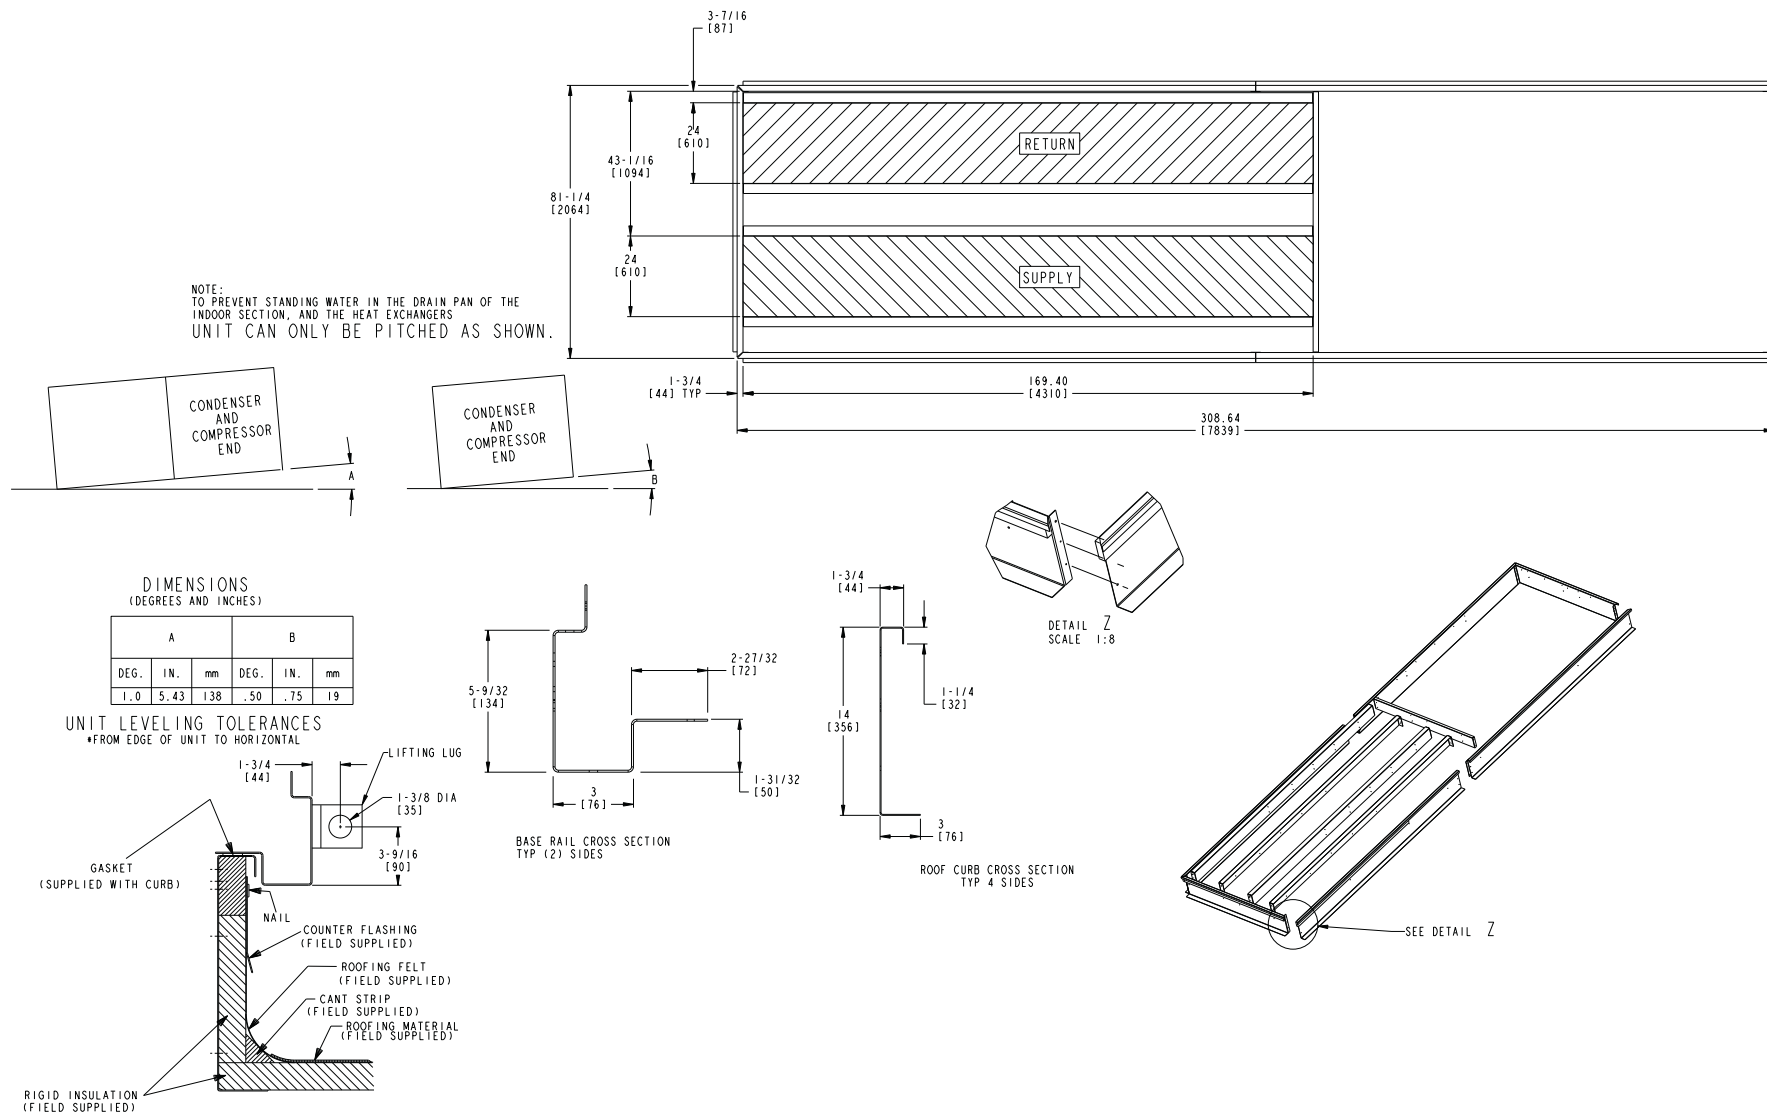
Roof Curb — 48A2,A3,A6,A7060 Units
